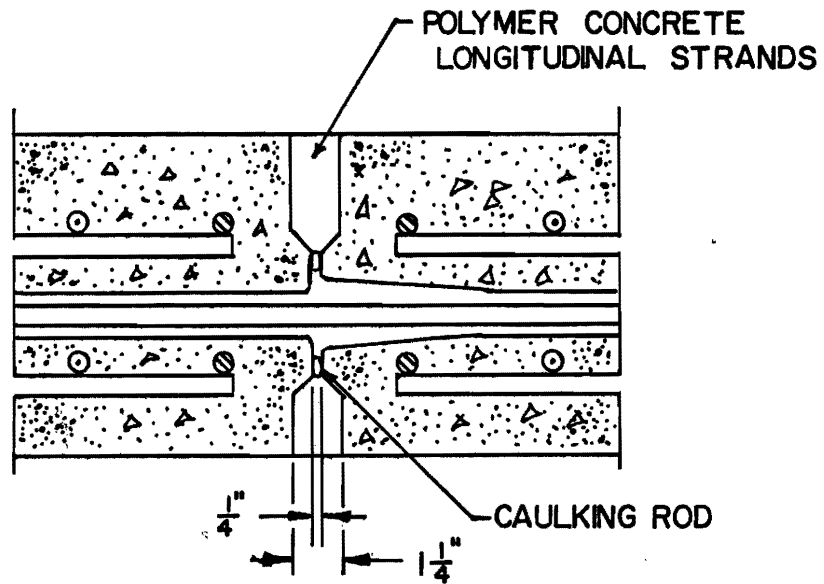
Panel-to-Panel Joint Details, Woodrow Wilson Memorial Bridge (5).
